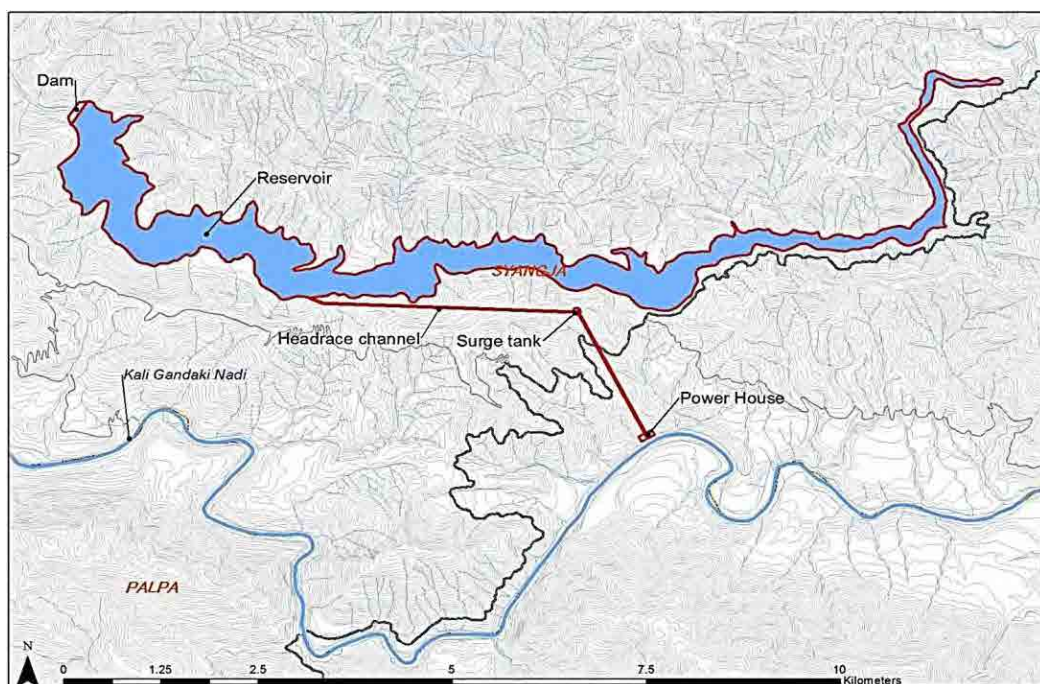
General Layout of the Andhi Khola Project (C-08)
